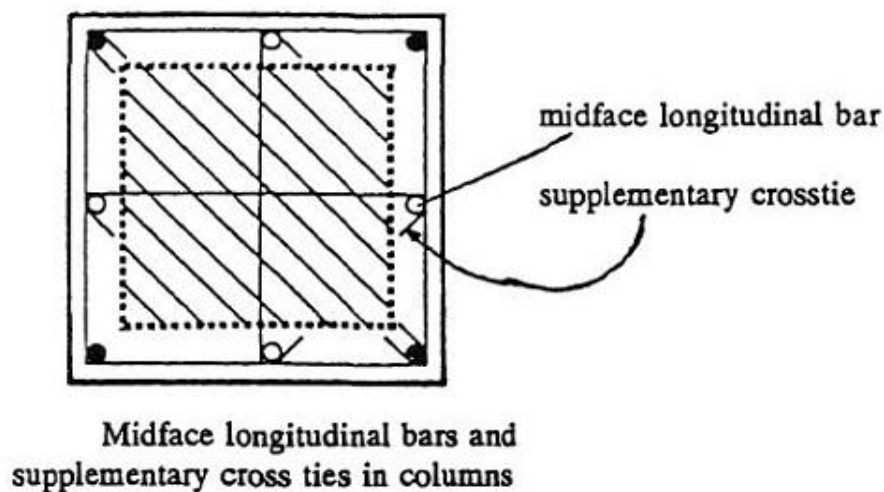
Reinforcement detail of Column Jacketing (Ref: www.sciencedirect.com)
